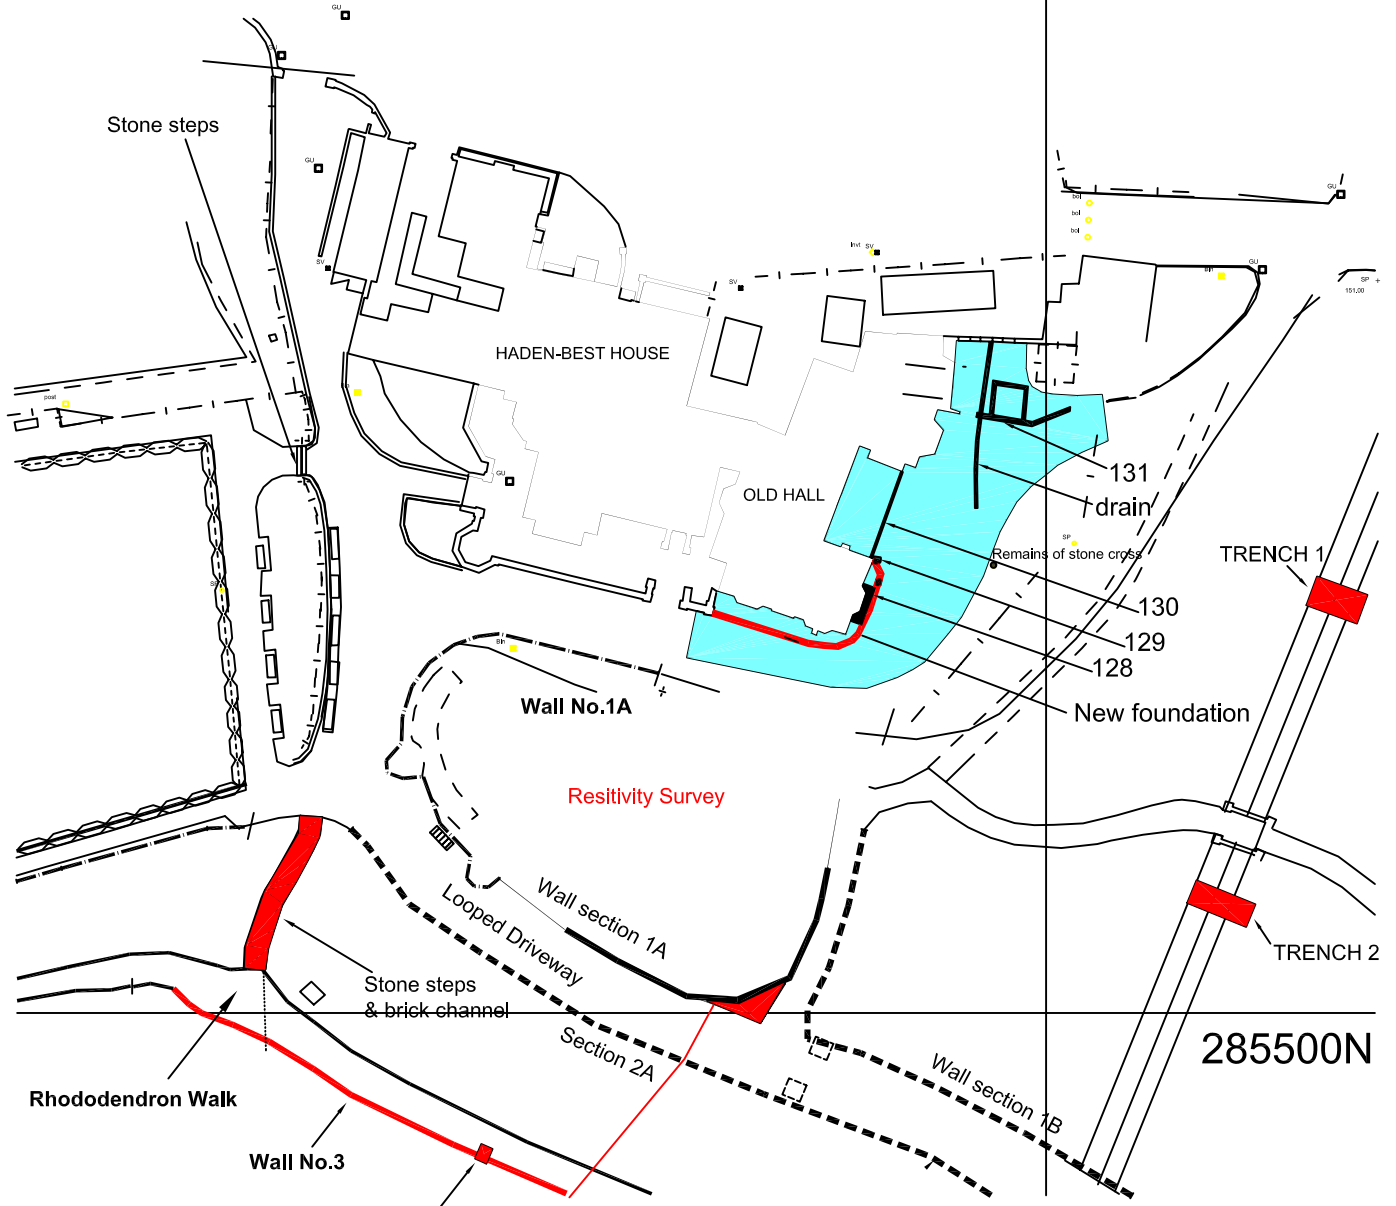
Plan of the area around the Old Hall showing the area of the watching brief undertaken in March 2004
